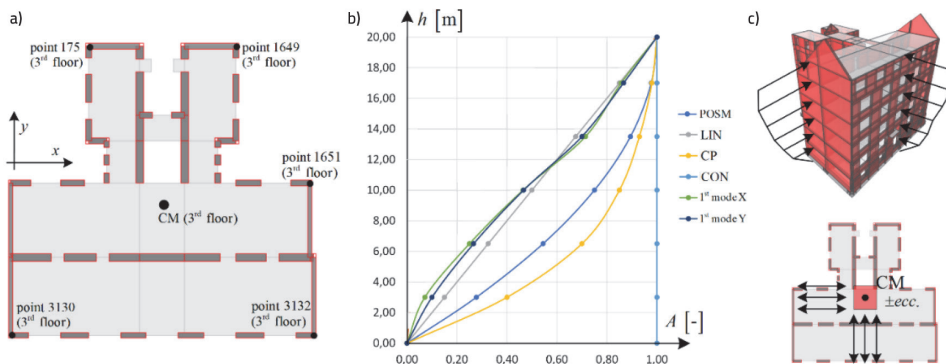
a) Building plan with the target point; b) Lateral force patterns; c) Schematic view of the lateral force application to the building model
